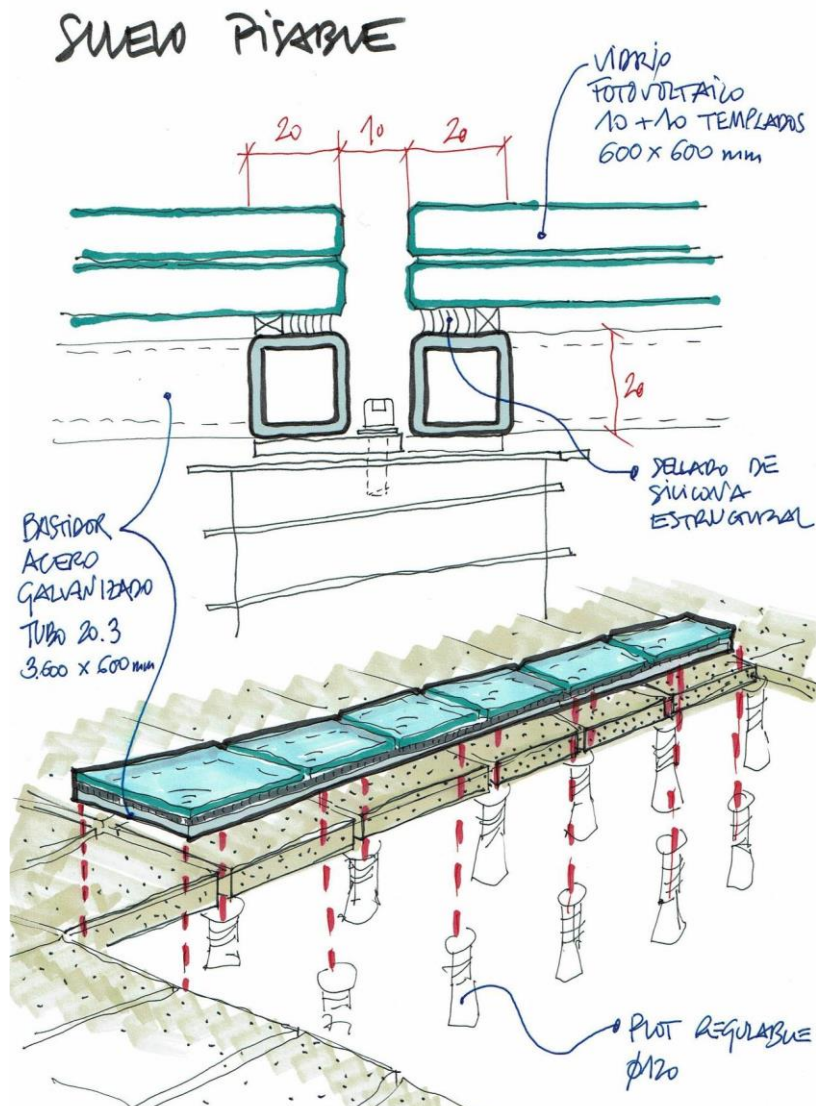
Walkable floor. Metallic frame over the plots to mount the PV tiles
